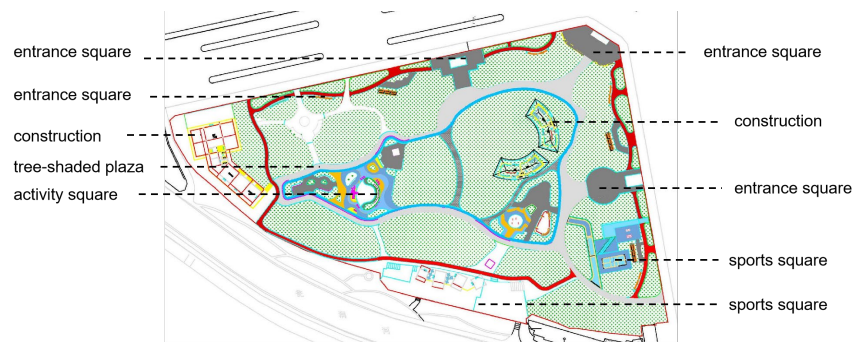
Site Plan of the Five Arch Bridge Park Renovation Project
